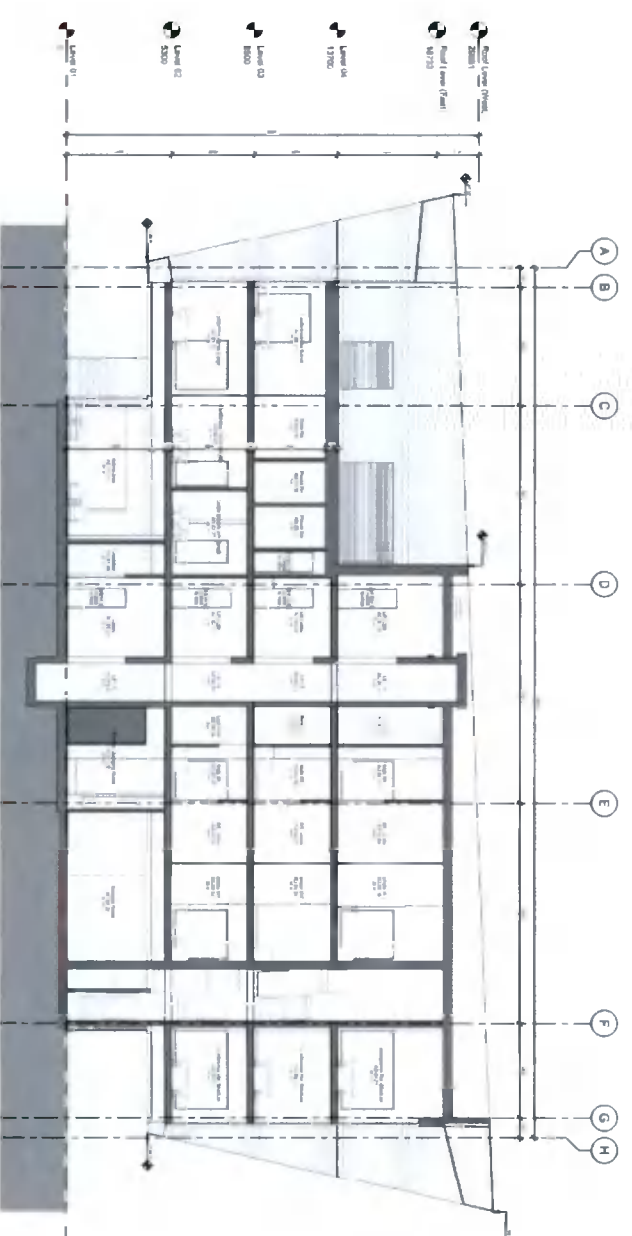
CENTRAL ADMINISTRATION BUILDING – SECTION THROUGH OFFICE ELEMENT
